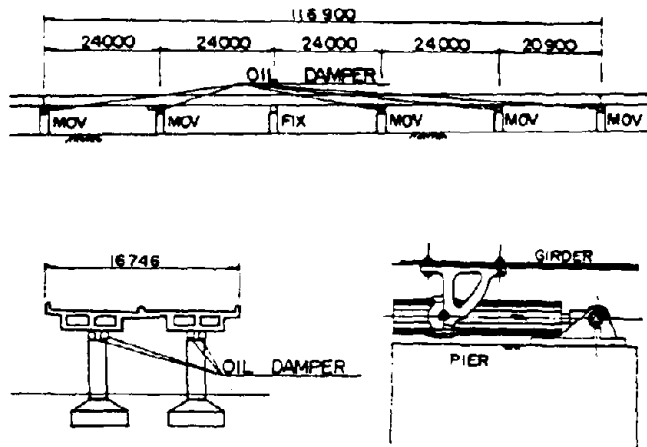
5-Span Continuous Highway Bridge with Viscous Damper Stoppers
